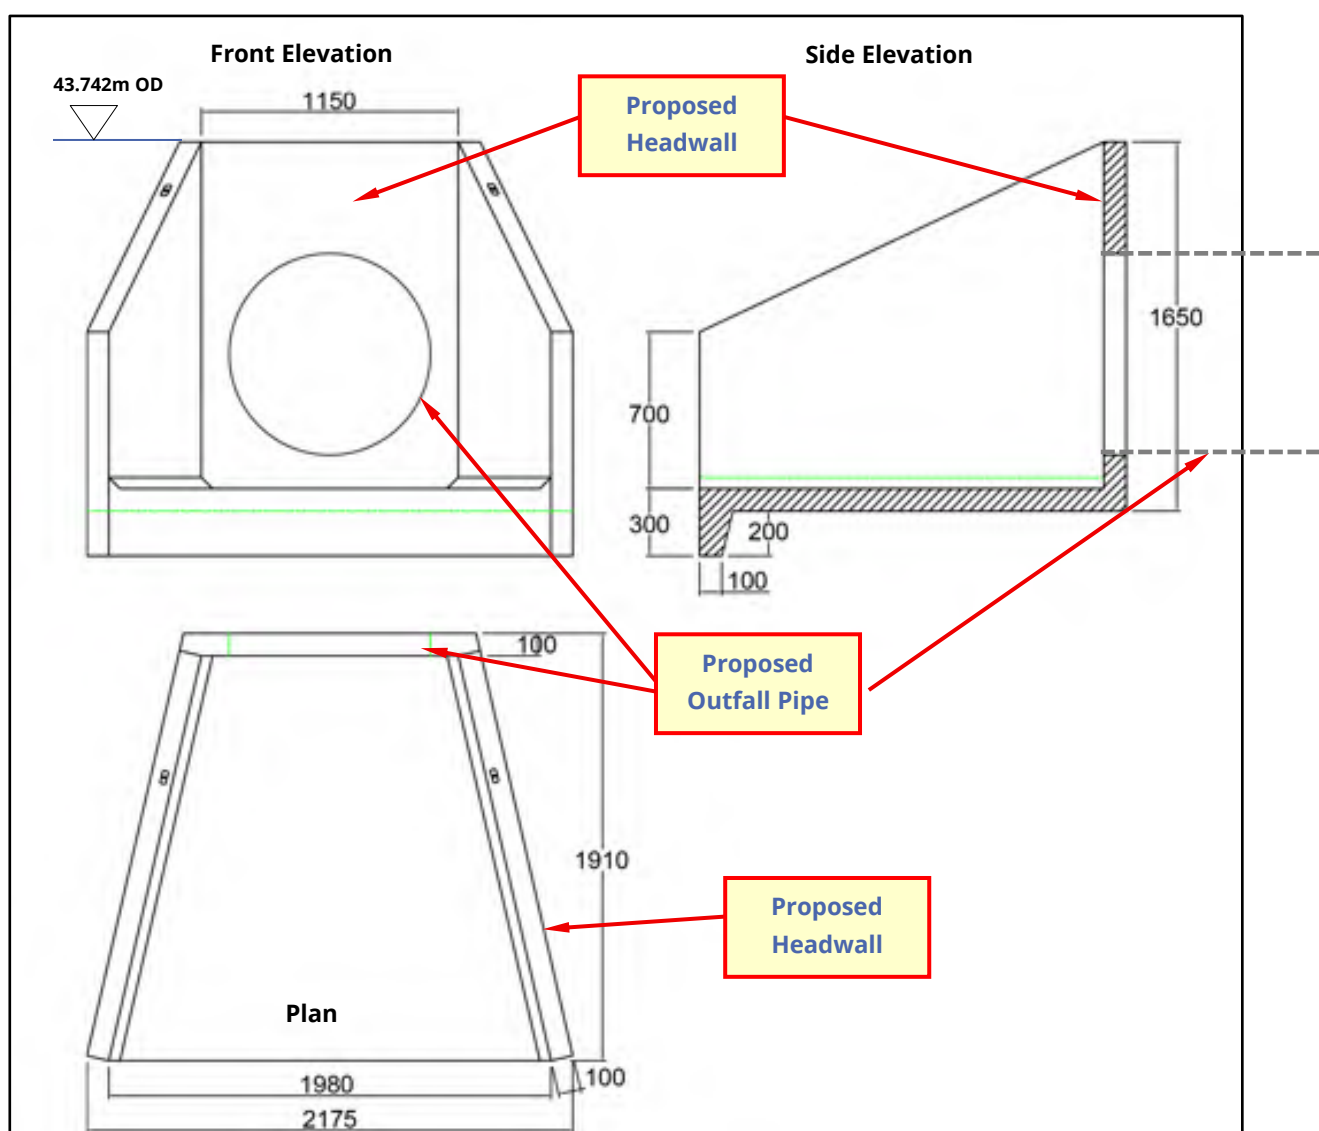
Proposed Outfall Pipe and Associated Headwall – Typical Layout
